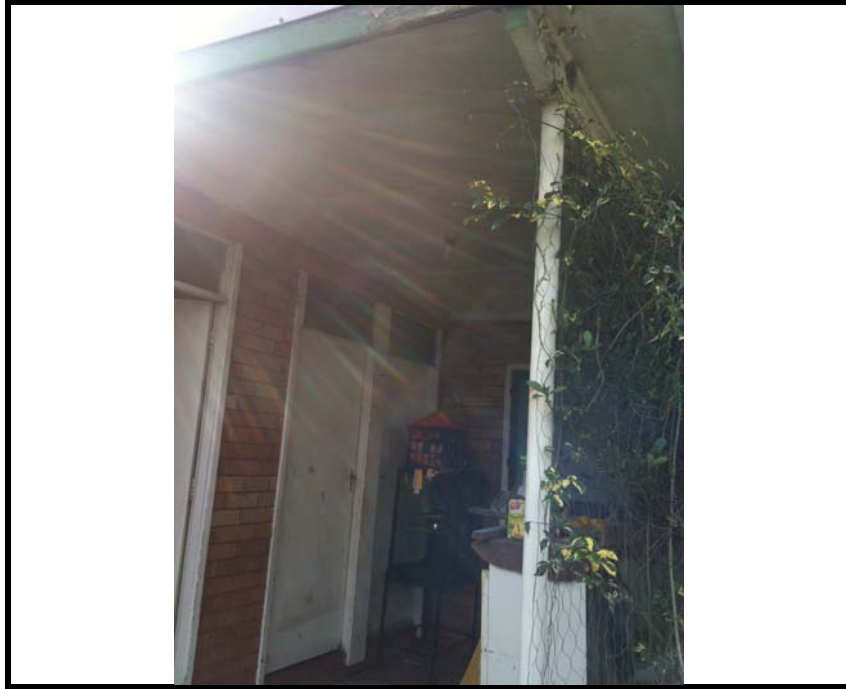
Example of the ACM sheeting used to the eaves and the undercover area at the rear to the brick section of 5 McLeod Road.
